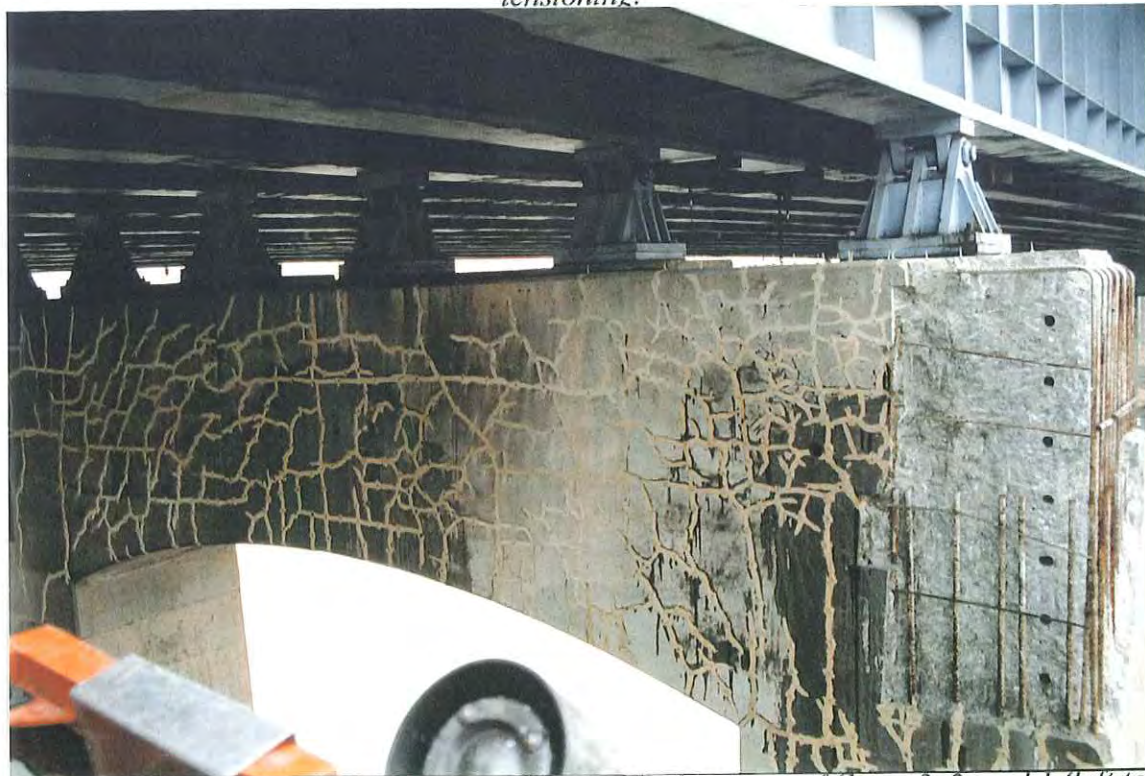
North face of Pier 39 south-bound. The locations of Cores 3, 2, and 1 (left to right) are shown, along with a closer view of the area prepared for post-tensioning.
